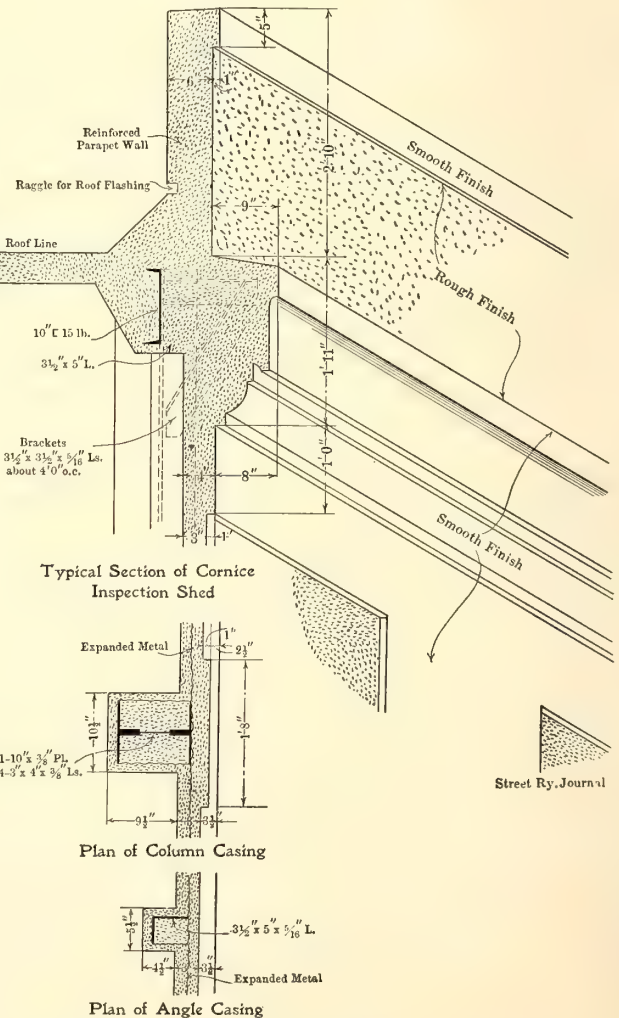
SECTIONS THROUGH CORNICES AND COLUMNS, SHOWING STYLE OF CONCRETE WORK
